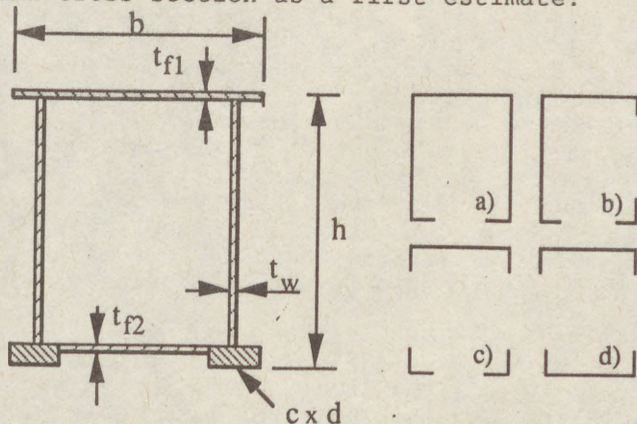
A typical box beam section where the bottom flange and the webs may buckle
